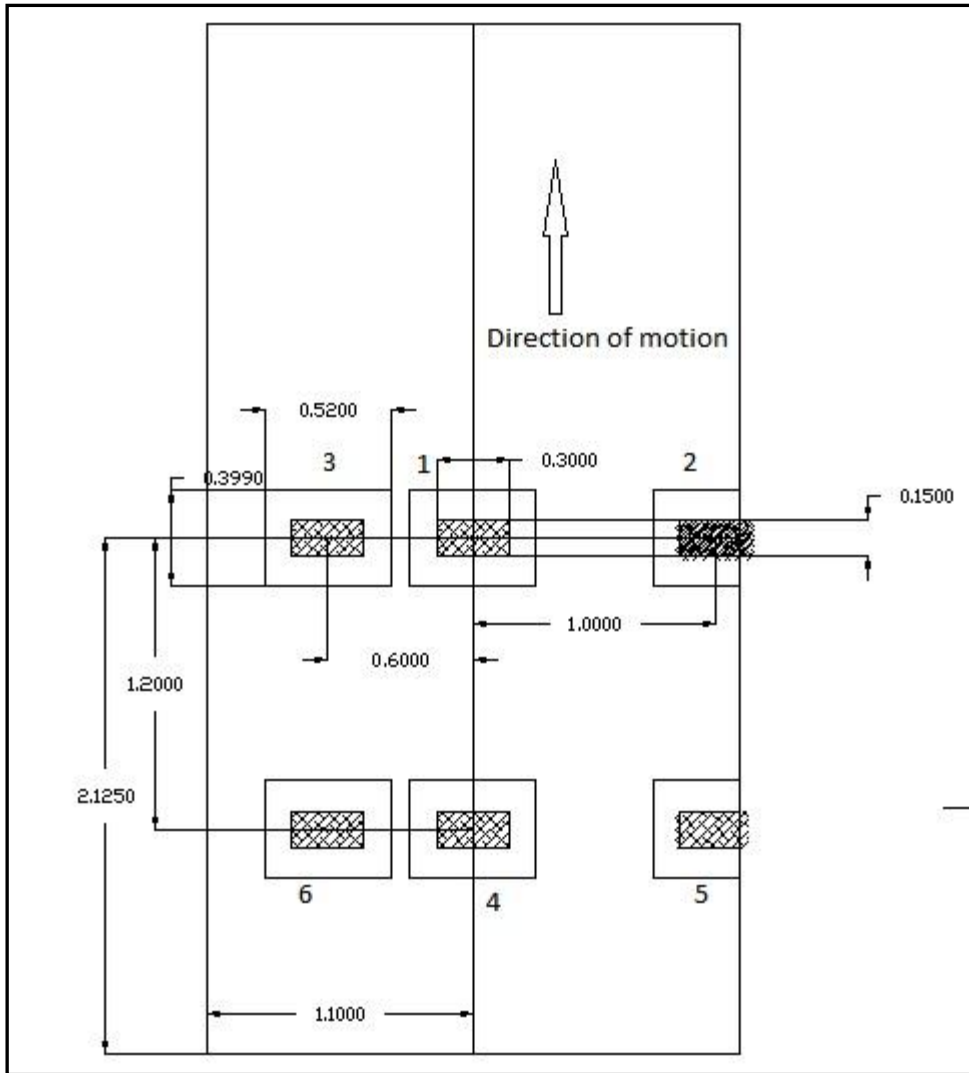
IRC CLASS AA WHEELED LOAD ON RCC GIRDER BRIDGE
